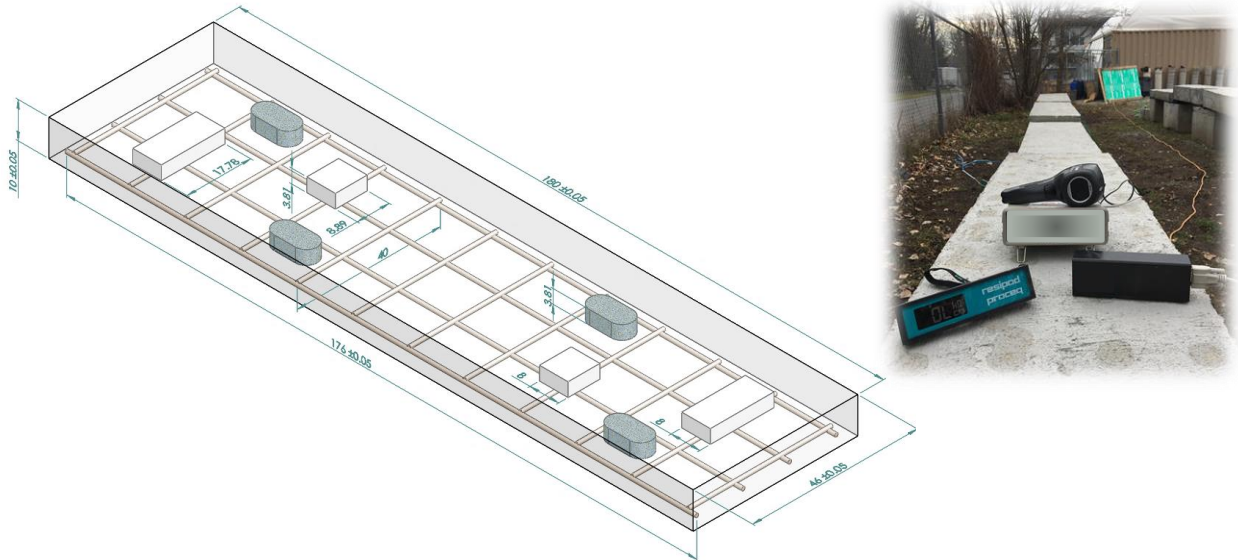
3D model of artificial defects in steel reinforced concrete slab
